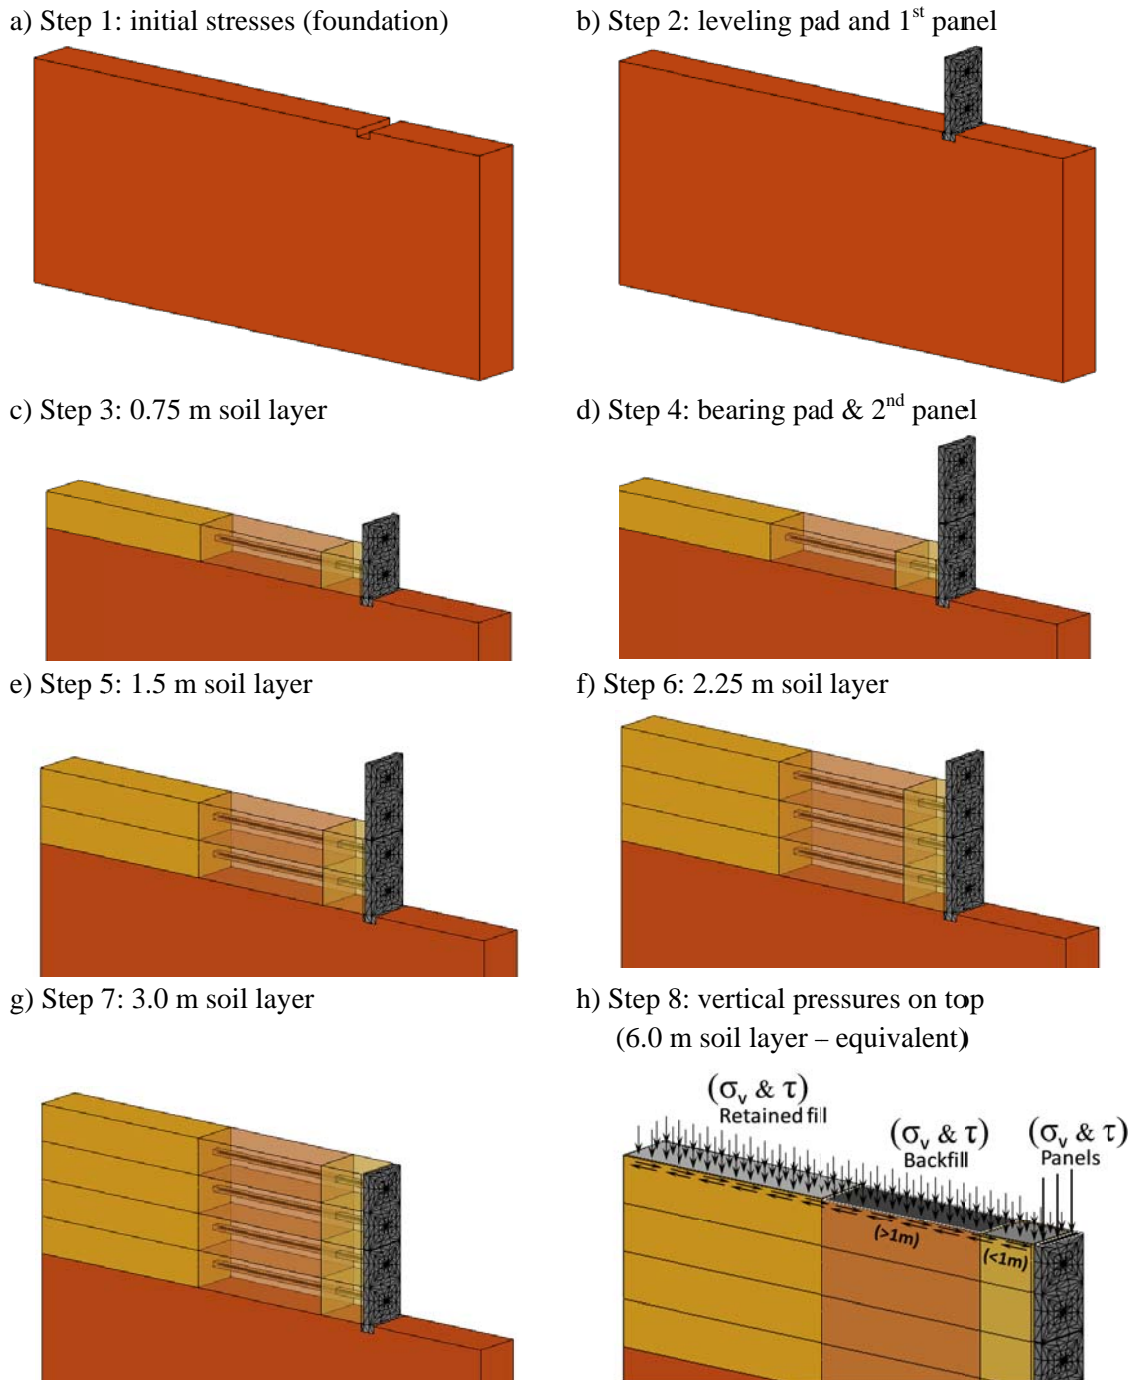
Stepped construction modeling process: from initial equilibrium at Step 1 (a) to 3 m soil pressure distribution on top of the 3 m model construction to generate 6 m-equivalent wall height construction at Step 8 (h).
